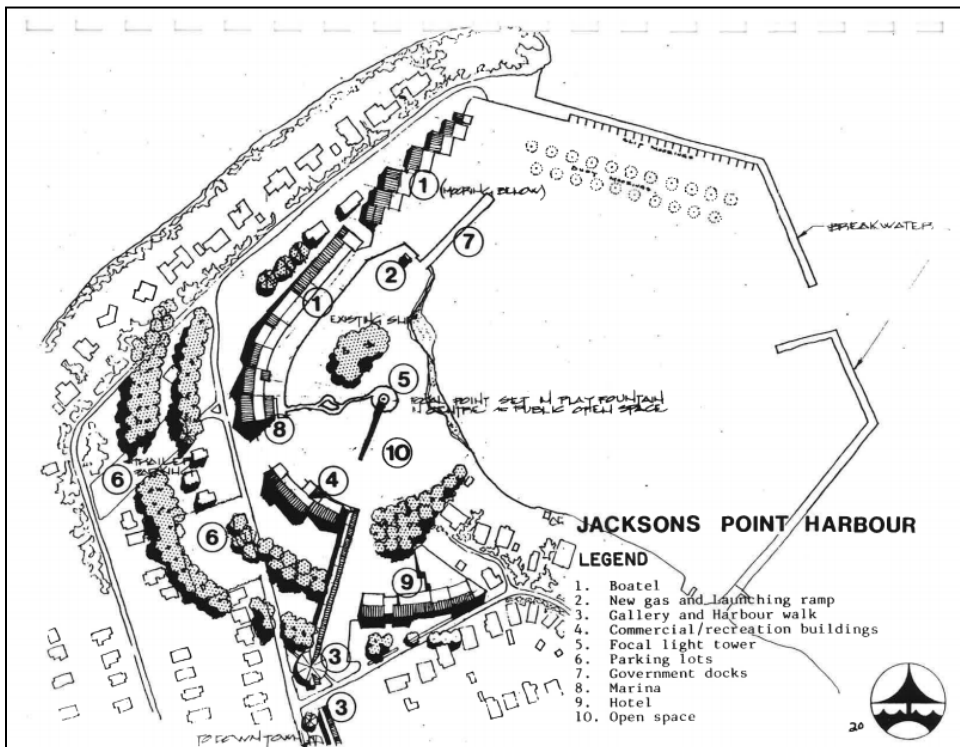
Jackson's Point CAUSE Plan - Harbour Plan (Ontario Association of Architects)
